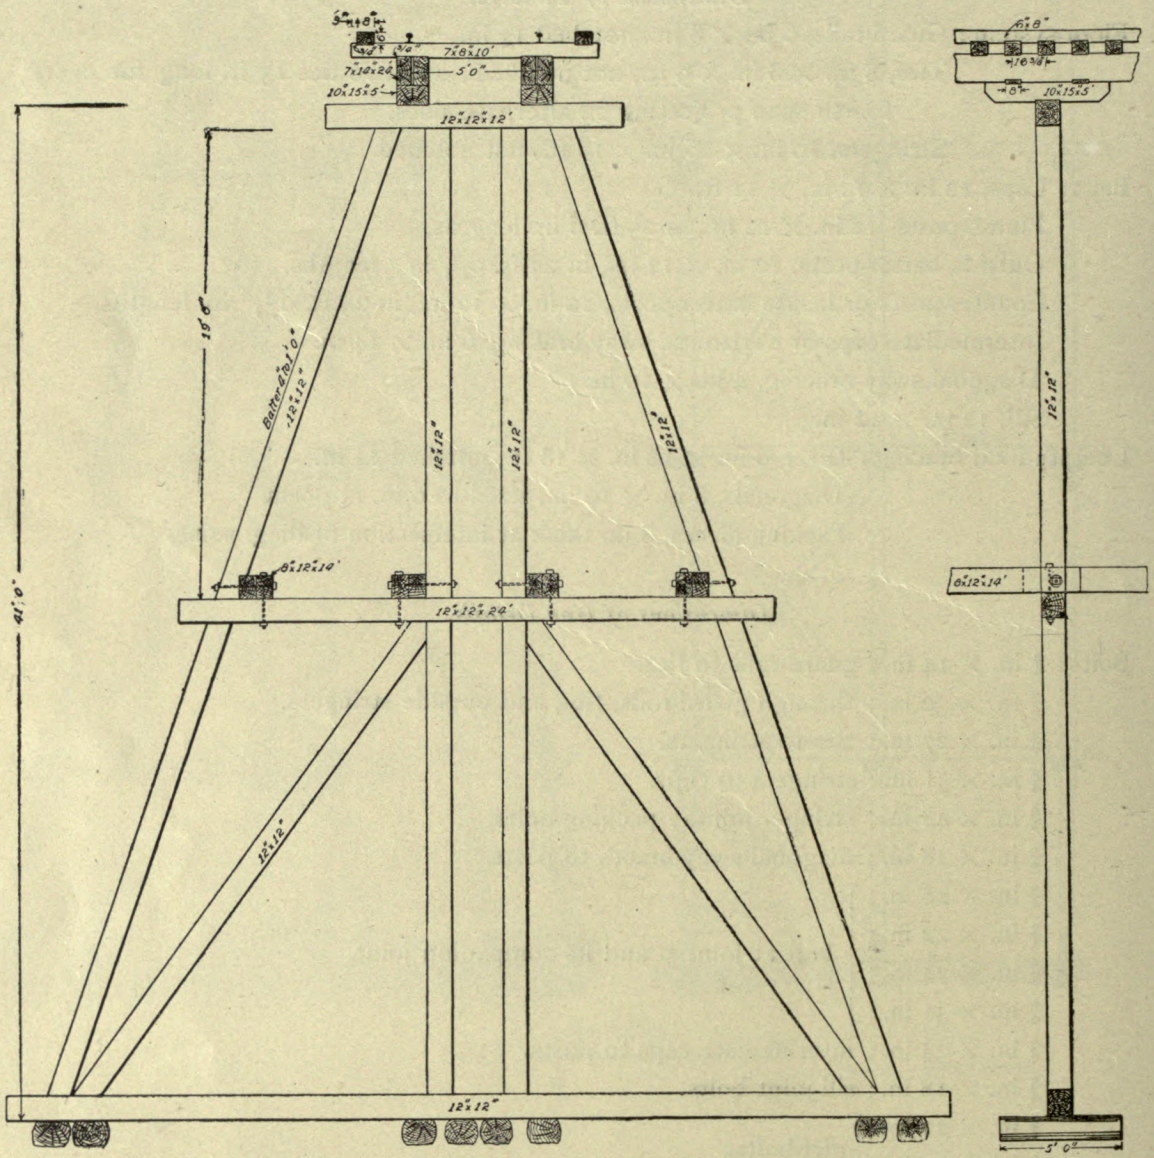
PLATE XIX.—FRAMED TRESTLE, OHIO CONNECTING RAILWAY.
